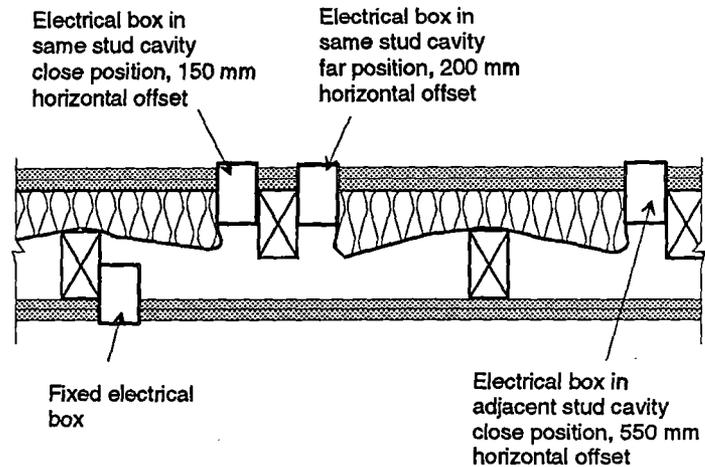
Positions of electrical boxes in the single stud wall. The single stud wall was constructed as follows:
